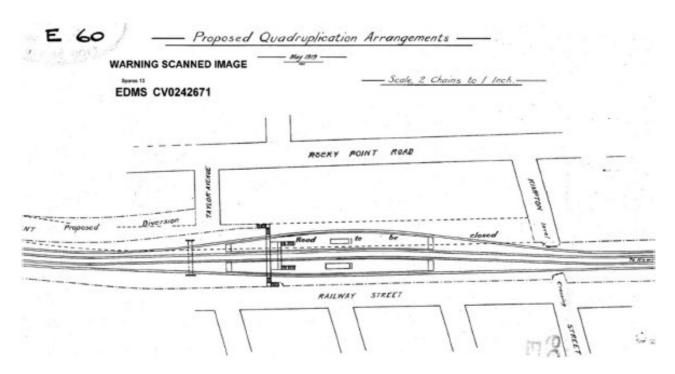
Banksia Station early plan for the quadruplication of the line, c.1919 (Source: Sydney Trains plan room)
